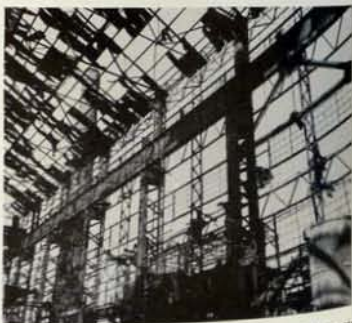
Group 26, Building 19. Typical construction in north half of building.
